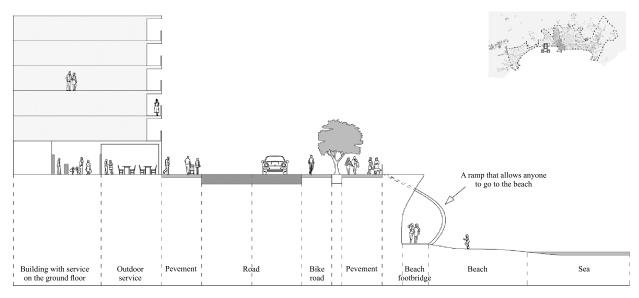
Section B-B. Sections of selected street in Benidorm, 5–6 storey buildings *Source*: own study.
